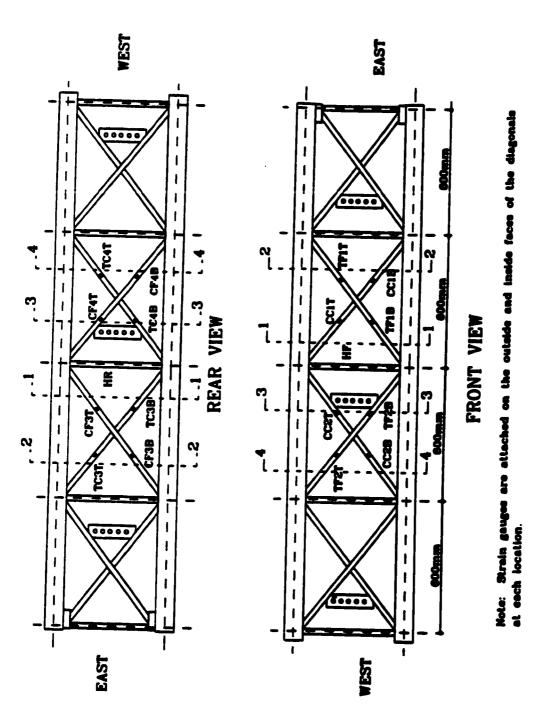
Locations of Strain Gauges and Sections for Equilibrium Check for Specimen LR16
